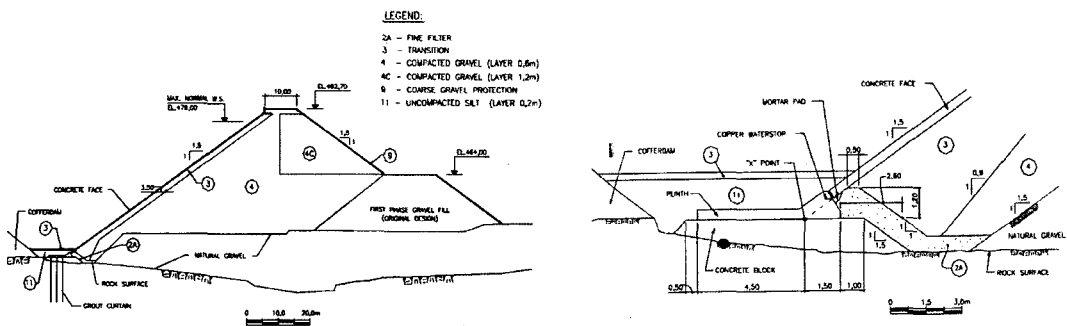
Cross section(left) and plinth(right) of Pichi Picun Leufu dam.
